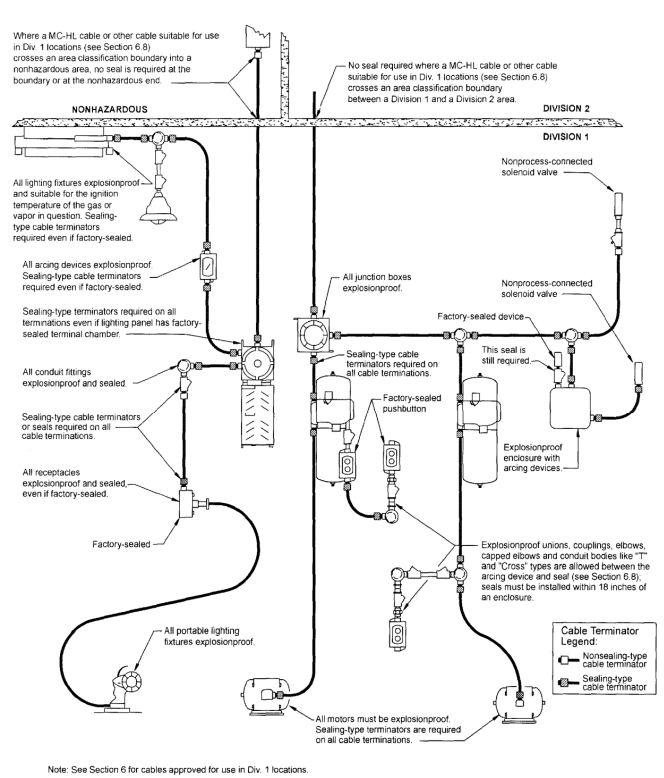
Typical Class 1, Division 1 Electrical Installation Cable System
